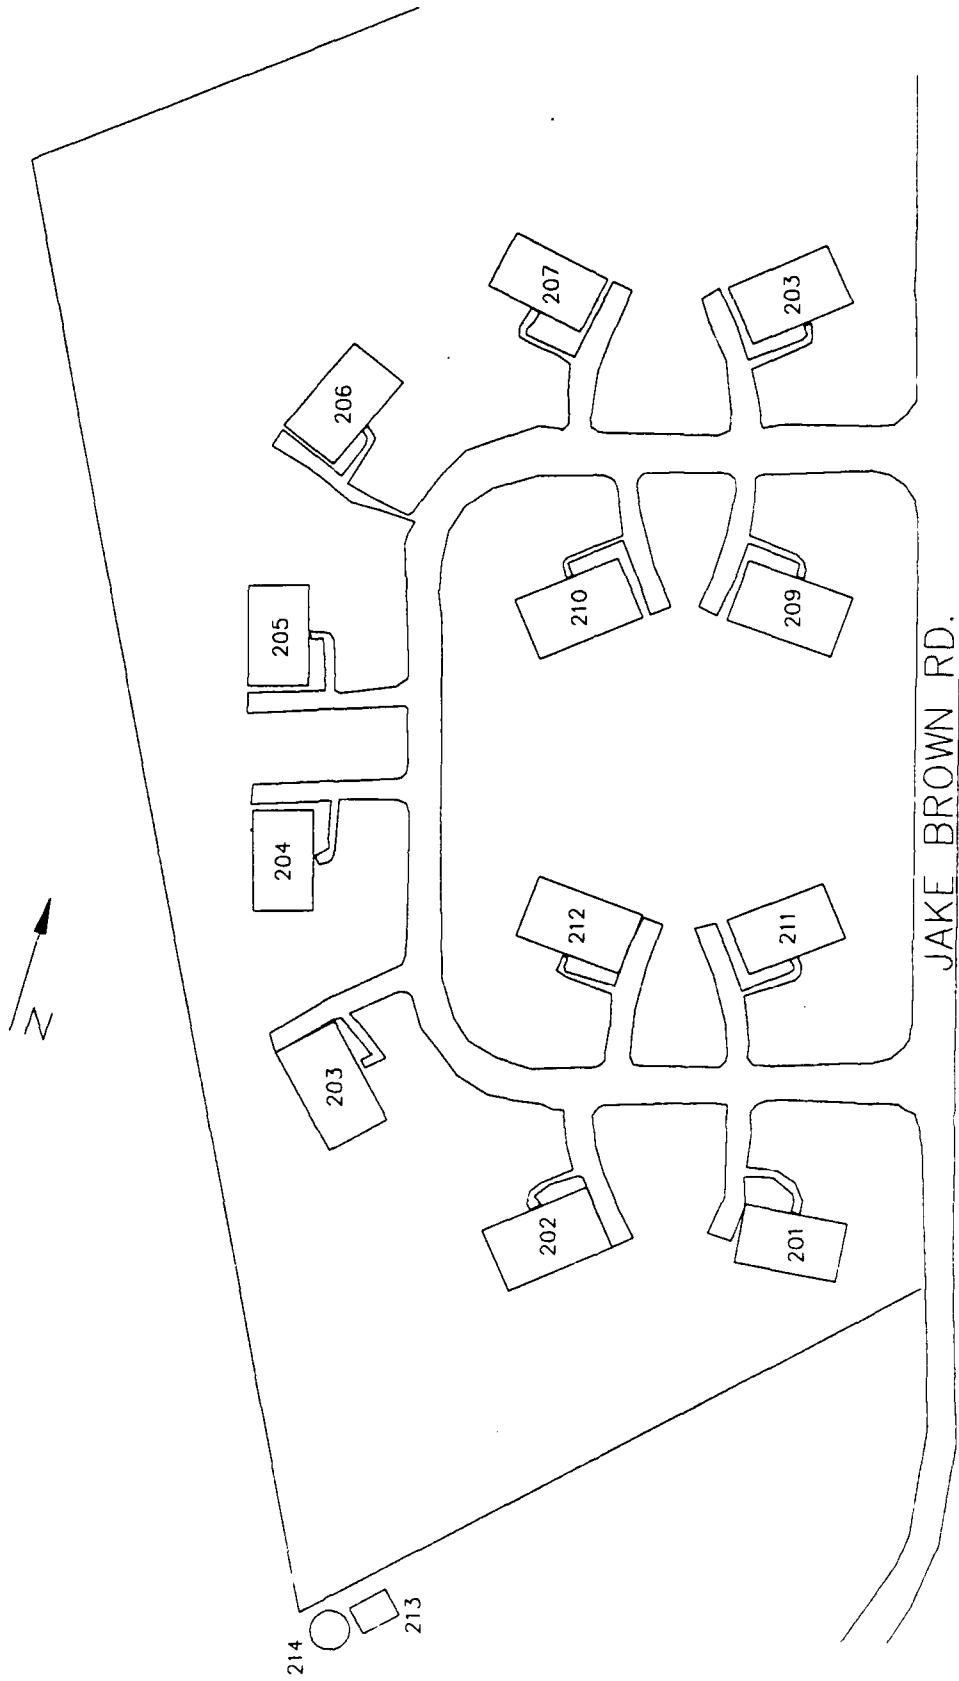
Site Plan Map of Old Bridge Army Housing Units
